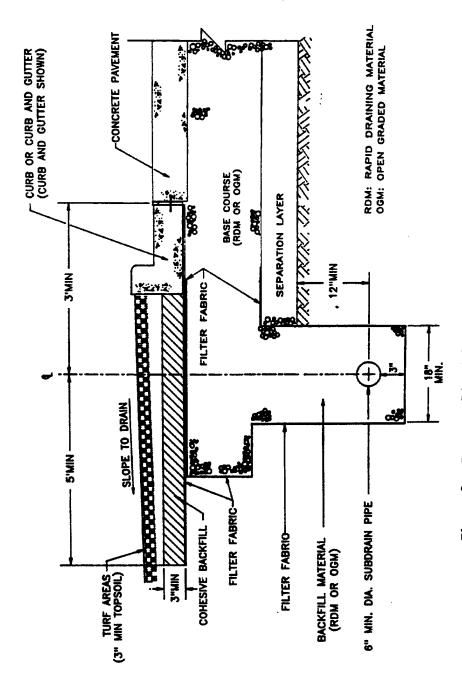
Pavement Edge Subdrain for Concrete Pavements
